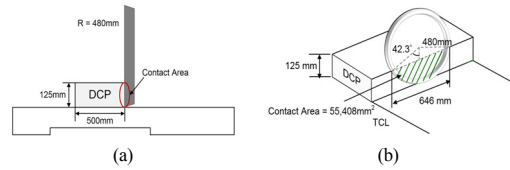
DCP-wheel impact area (a)Side view (b)3D view
